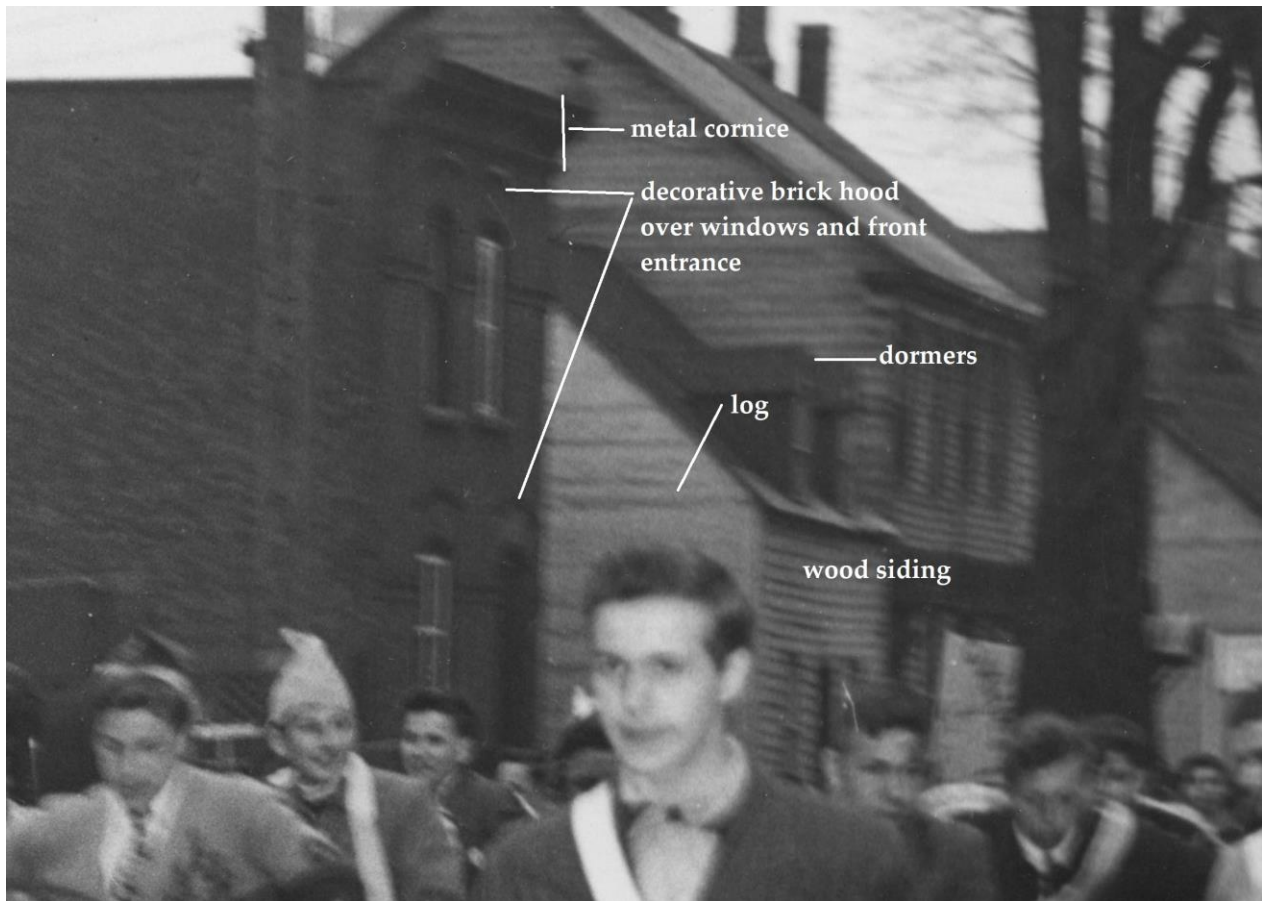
A c.1949 picture with the two houses in the background clearly documents the brick siding of 174 Murray Street and the cottage form of the neighbouring 168 Murray. The textured sidewall of 168 suggests the squared log that has been covered over on the front façade with a horizontal siding. The off-set door on the 2-storey has an arched header. Source: Marc Aubin's collection
